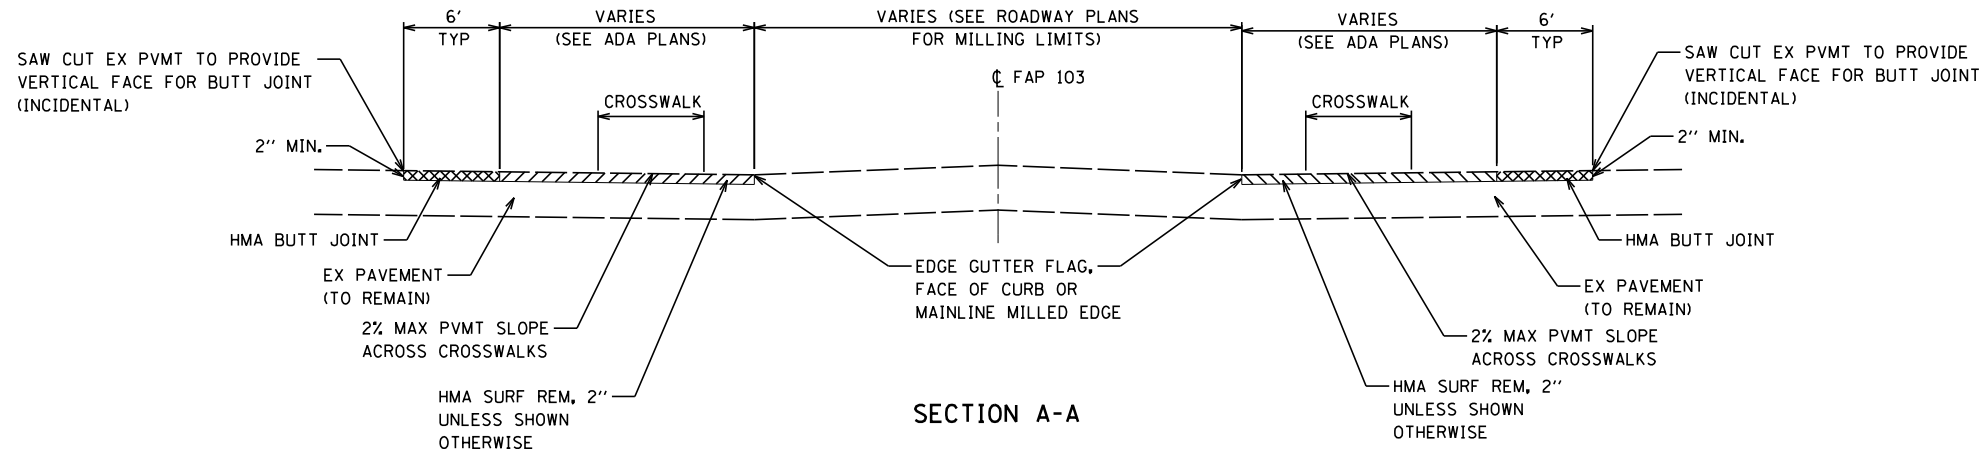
DETAIL PR TIE TO EX PAVEMENT TO REMAIN
